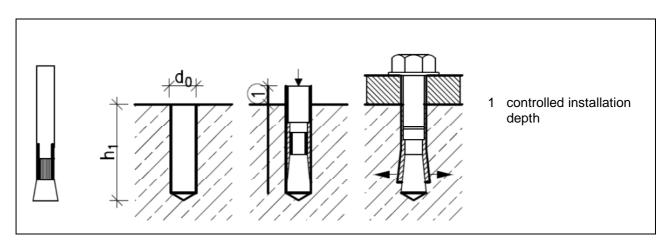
Sleeve-down type fastener; drilling with stop drill
